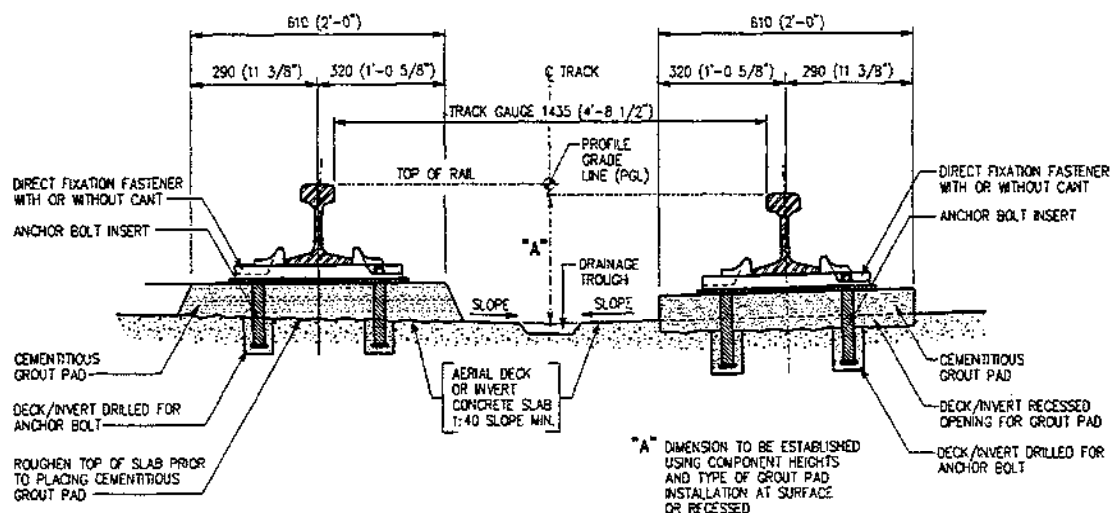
Cementitious Grout Pad Design—Direct Fixation Track
